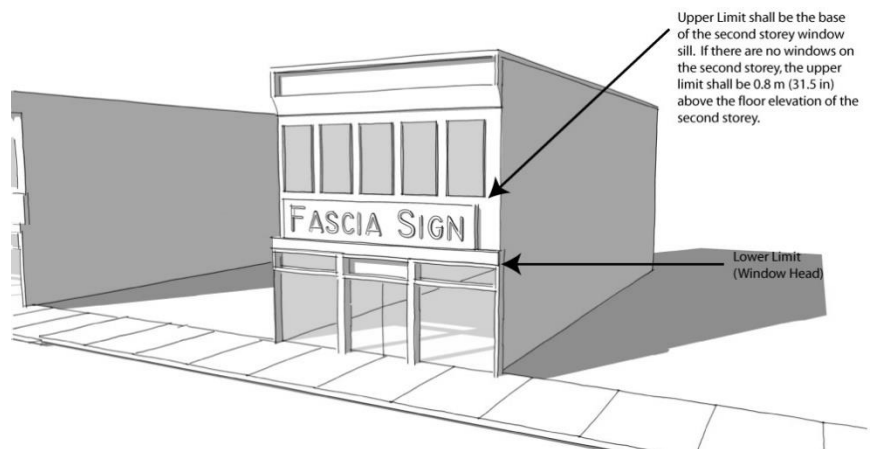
FASCIA SIGN PLACEMENT, TWO STOREY BUILDING
